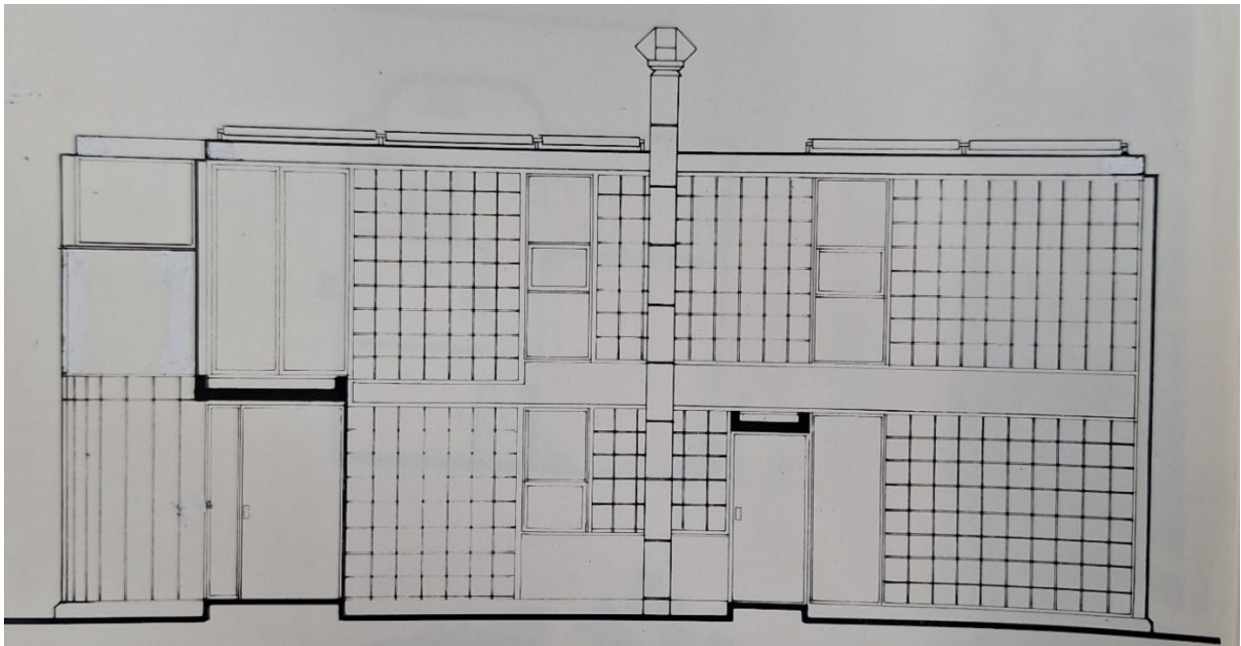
Drawing of north elevation of 2 Hedgewood Road (Hamilton, Ridgeley, Bennett Architects, 1974).
